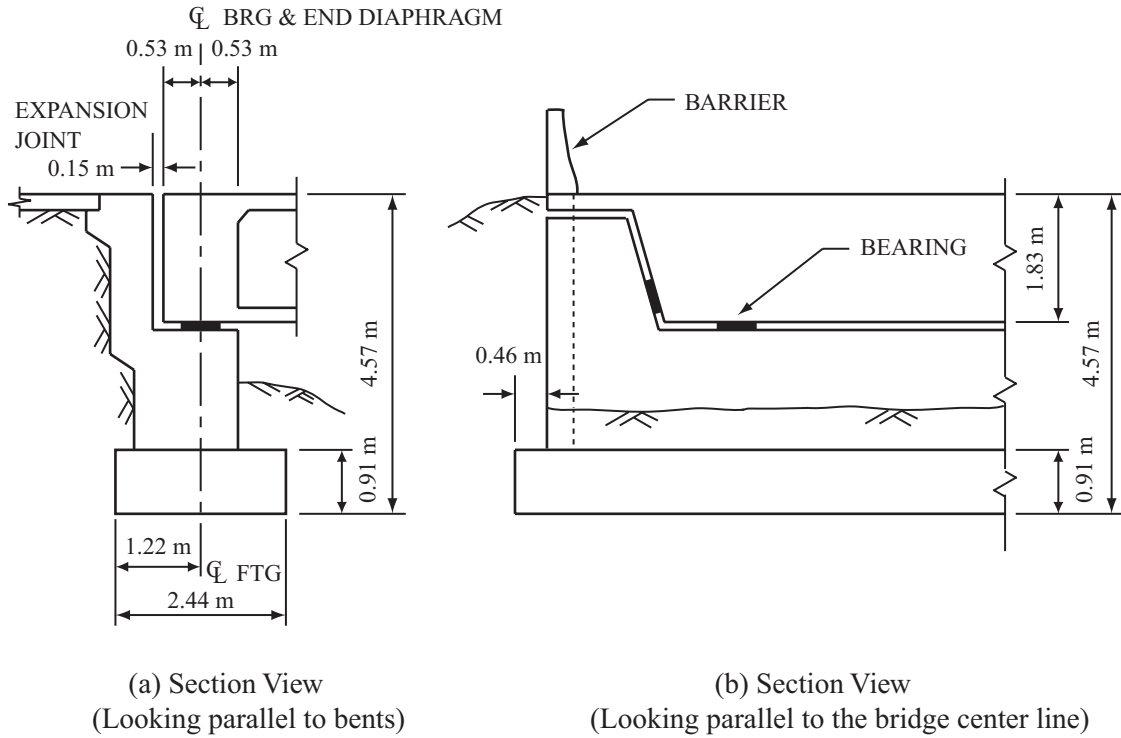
The abutment section view of the FHWA No. 4 bridge (Courtesy of the FHWA).
